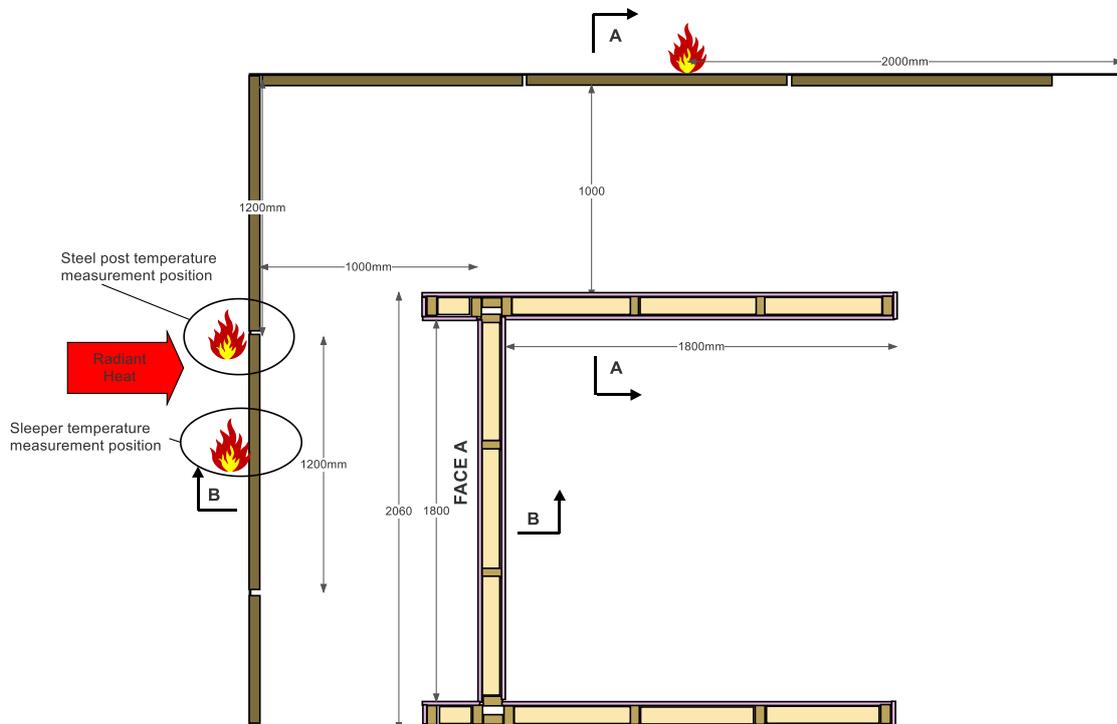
Sleeper wall below house level and 1 m in front of the house façade facing bushfire front.
